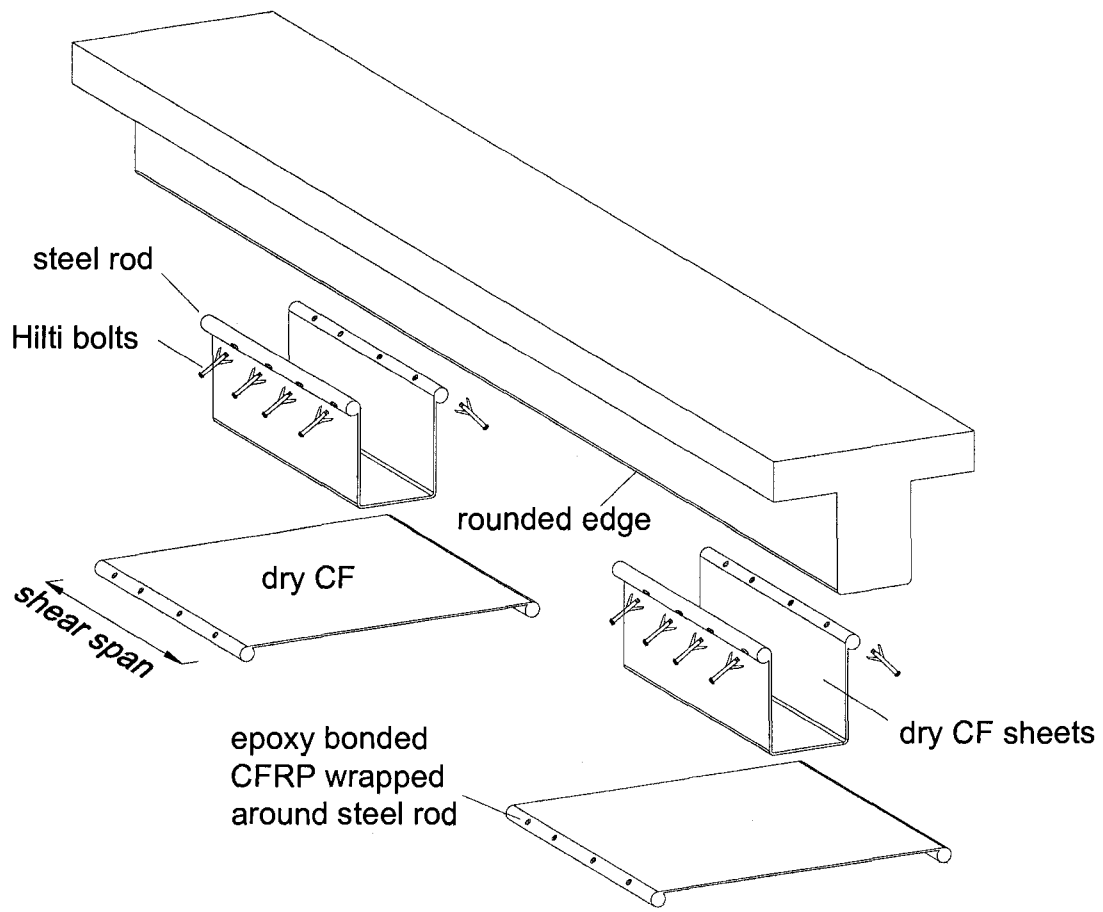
Detailed view of the U-shaped dry CF anchorage system
